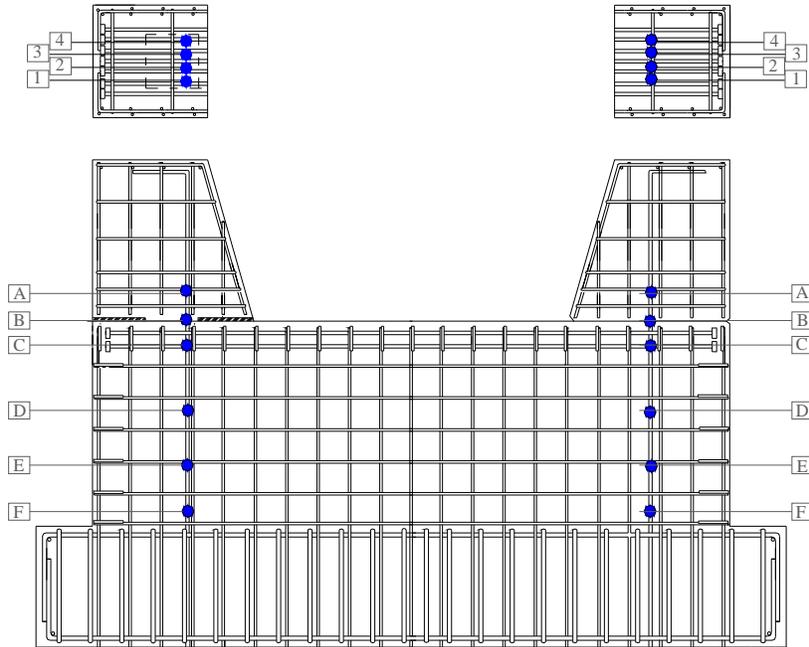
14- Labels of Strain Gages on Vertical Shear Key Reinforcement- Test Series V
